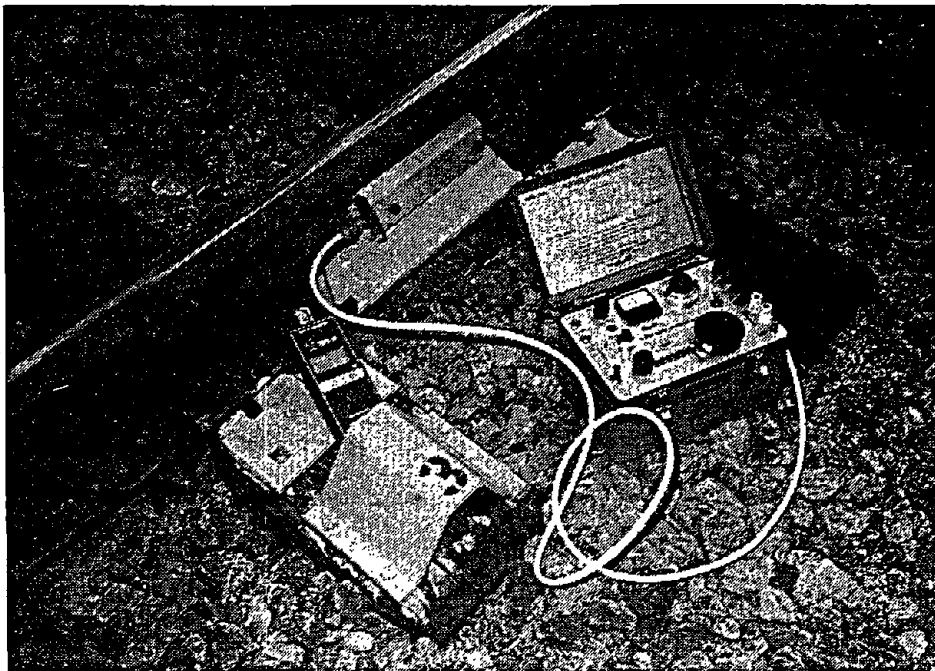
TYPICAL RNT INSTRUMENTATION SITE INSTALLATION
